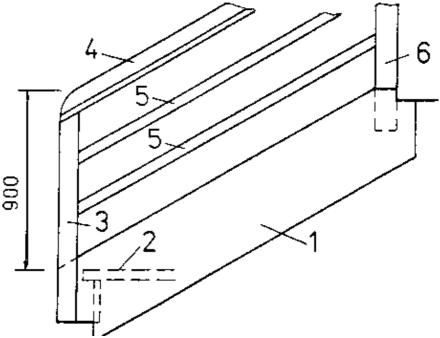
Stair railing with parallel bars – 1 *outer string, 2 bottom stepp, 3 bottom post, 4 handrail, 5 railing bars, 6 head post
